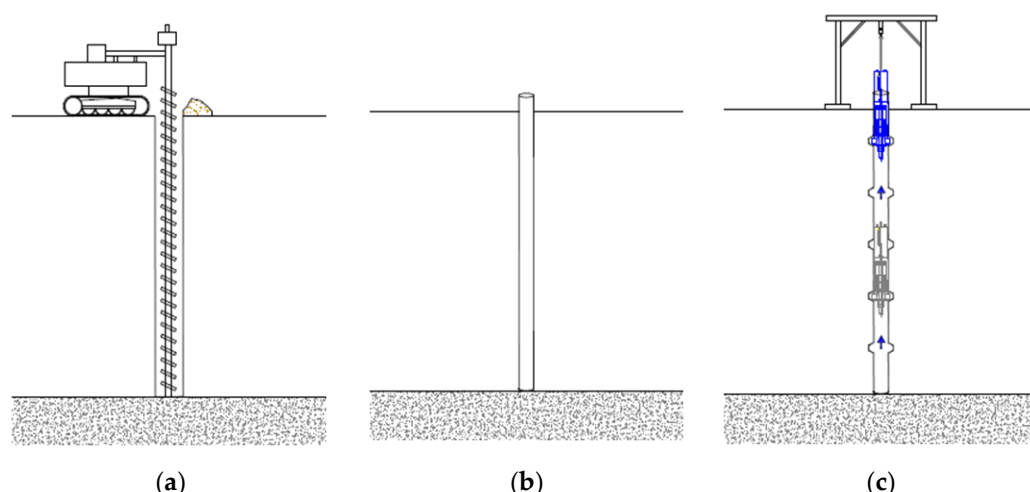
Construction sequence of expanded steel pipe pile: (a) Boring; (b) Insertion of steel pipe pile; (c) Expansion of steel pipe at constant intervals.
